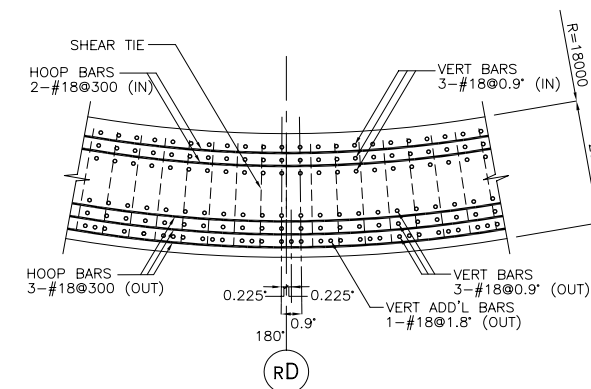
G.1-41. Reinforcing Steel of Foundation Mat: Section A-A
